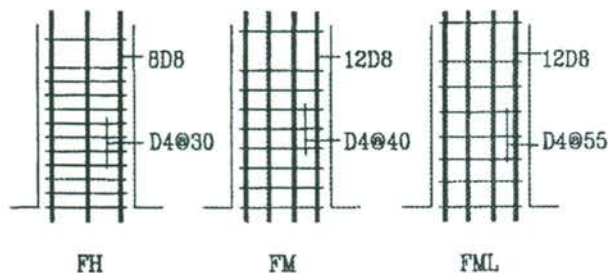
Dimensions and reinforcement arrangement of test frames.
